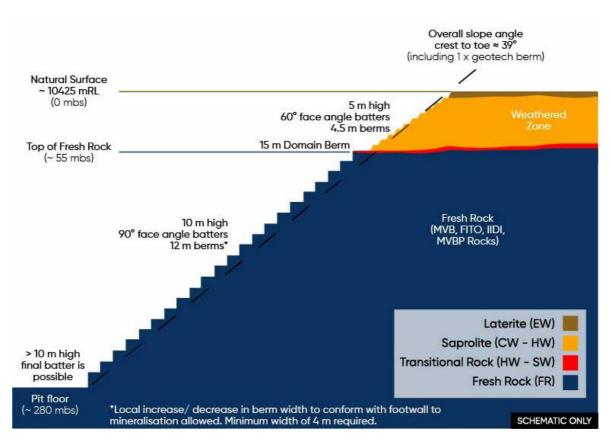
NEB Pit Domain A Wall Design Parameters
